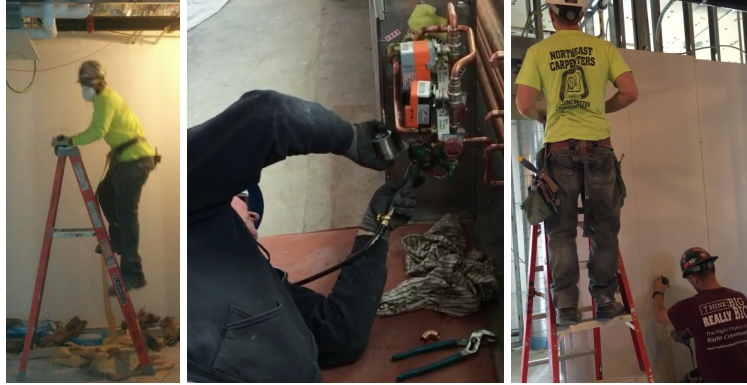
Observations from the construction site (left to right): a roof paneling installer climbing a ladder, plumber welding copper pipes, and collaborative drywall installation.
